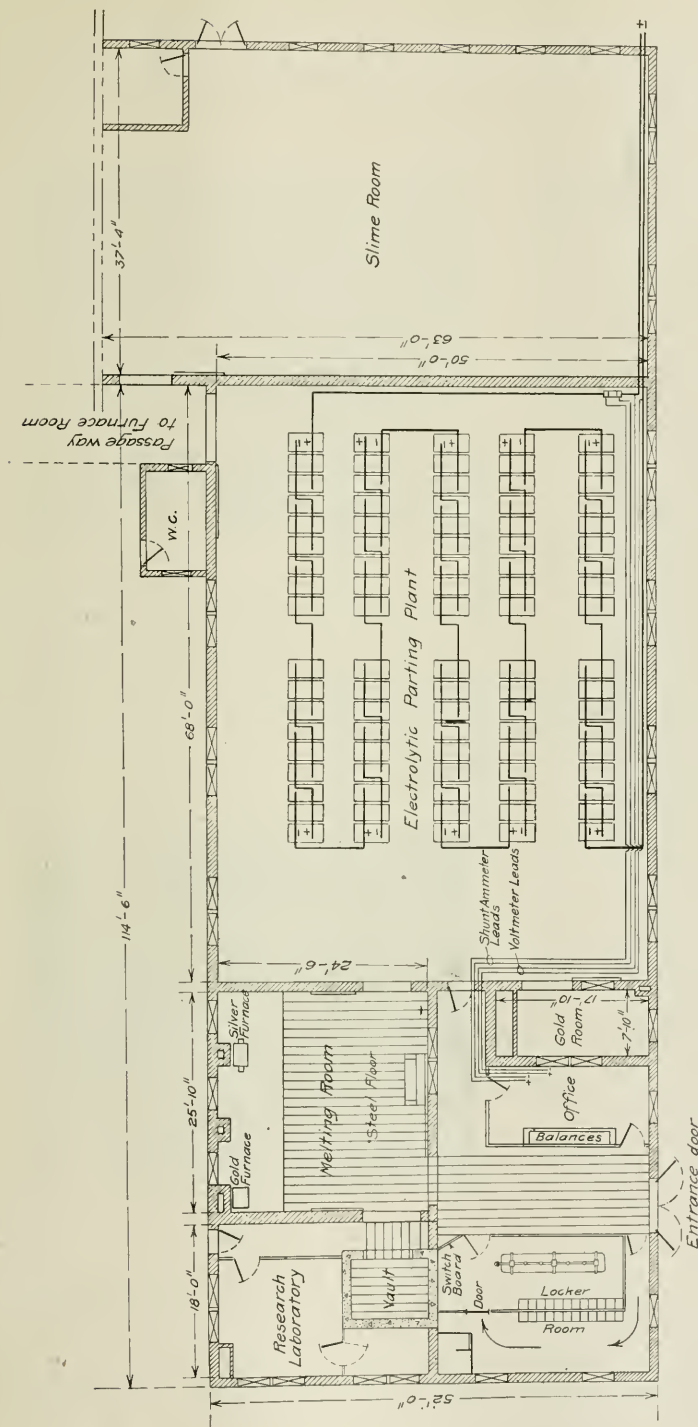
FLOOR PLAN OF PARTING PLANT AND LOCKER ROOM.
